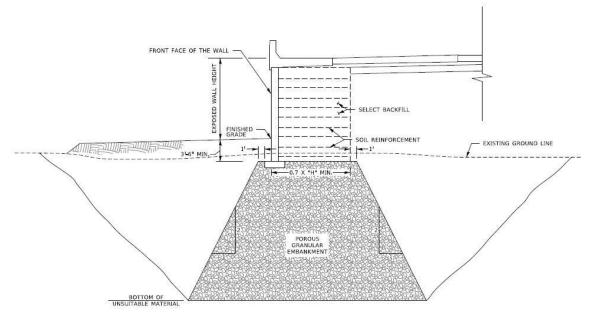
Structural Fill Placement below MSE Wall Footing
